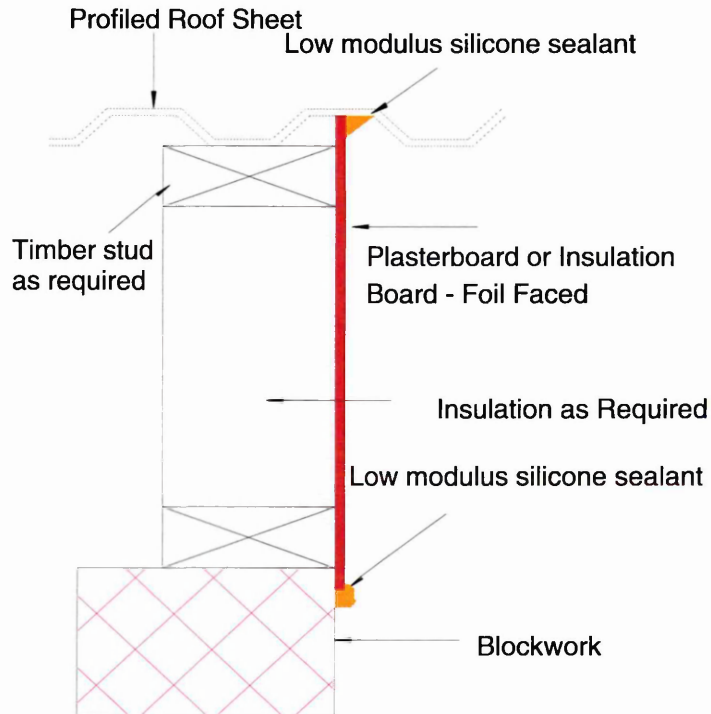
Airseal detail at blockwork wall to roof sheet eaves detail.
